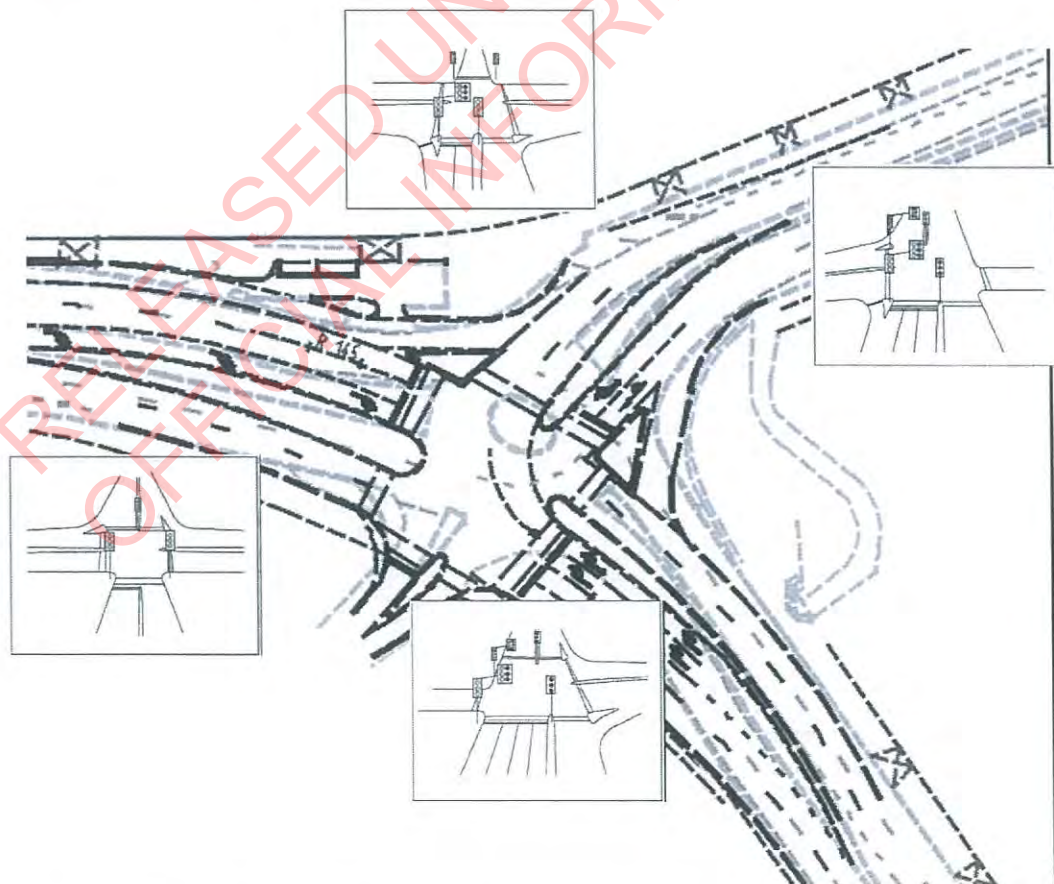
Proposed Signalisation Layout for Morrinsville Intersection
